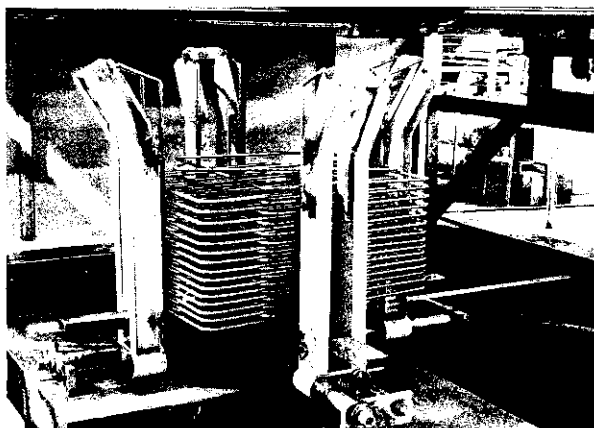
Manufacturing of MULTI SPIRAL HOOP
